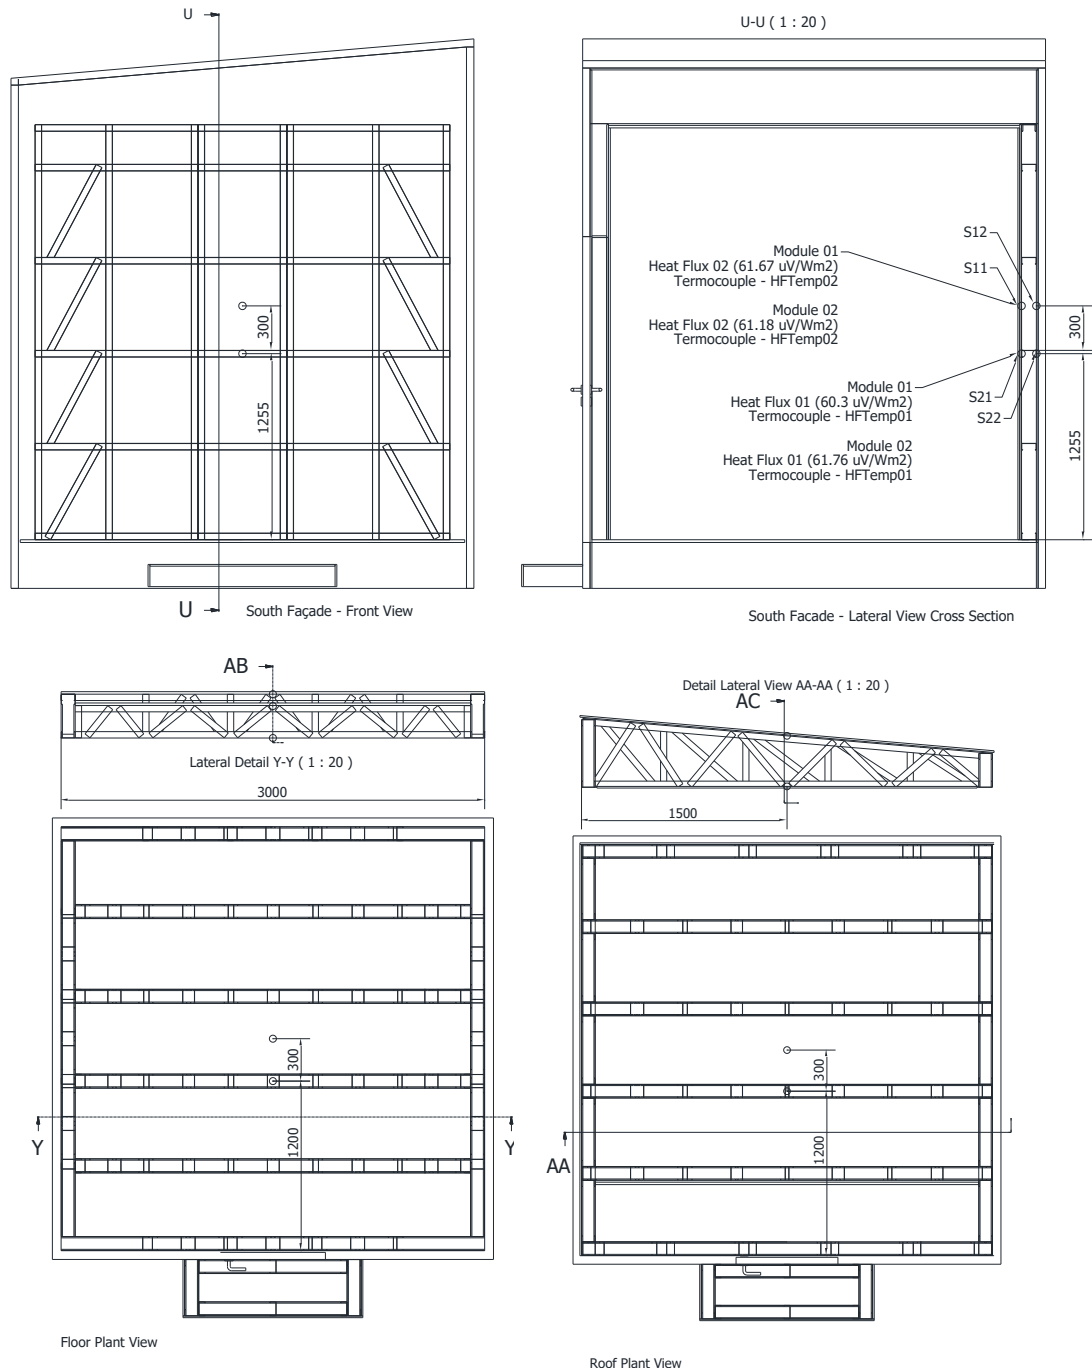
Example of sensors map for south wall, roof and slab.
